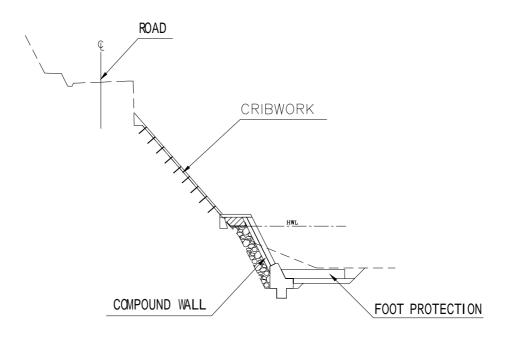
Countermeasure for slope failure due to scouring around Sta.13+300
